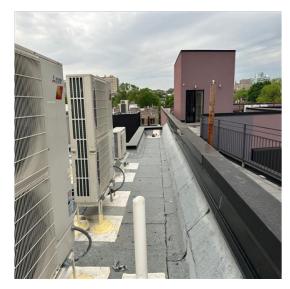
Observation: Overview photos of the roof at 373 Prospect Pl. The roof covering was observed to be TPO.
